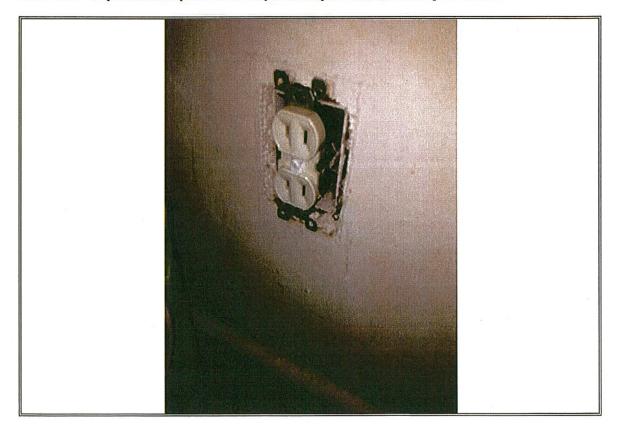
Representative photo of the drywall sampled behind the outlet plate.
